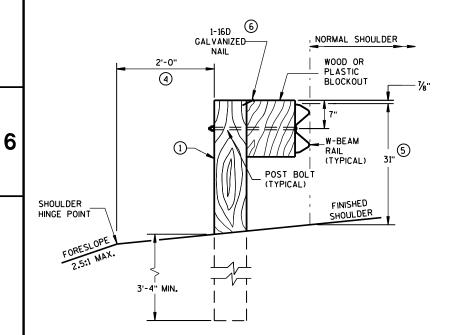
DETAIL B (BEAM GUARD AND TERMINAL SECTION NOT SHOWN)
